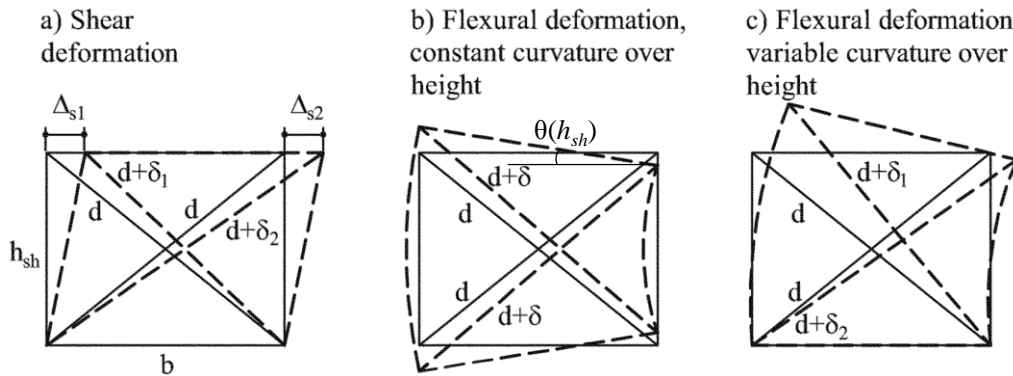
Wall shear deformation calculation (Beyer et al. 2011)
